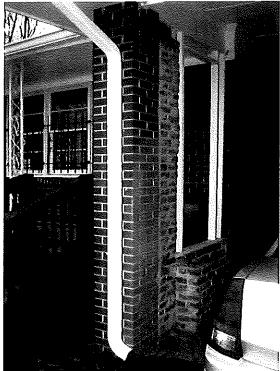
Carport opening to porch (detail) at south elevation; looking northwest.
